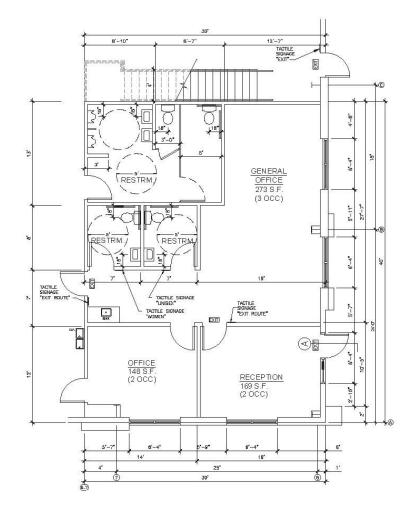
Conceptual Overall Building Floor Plan Source: Van Dam Engineering
